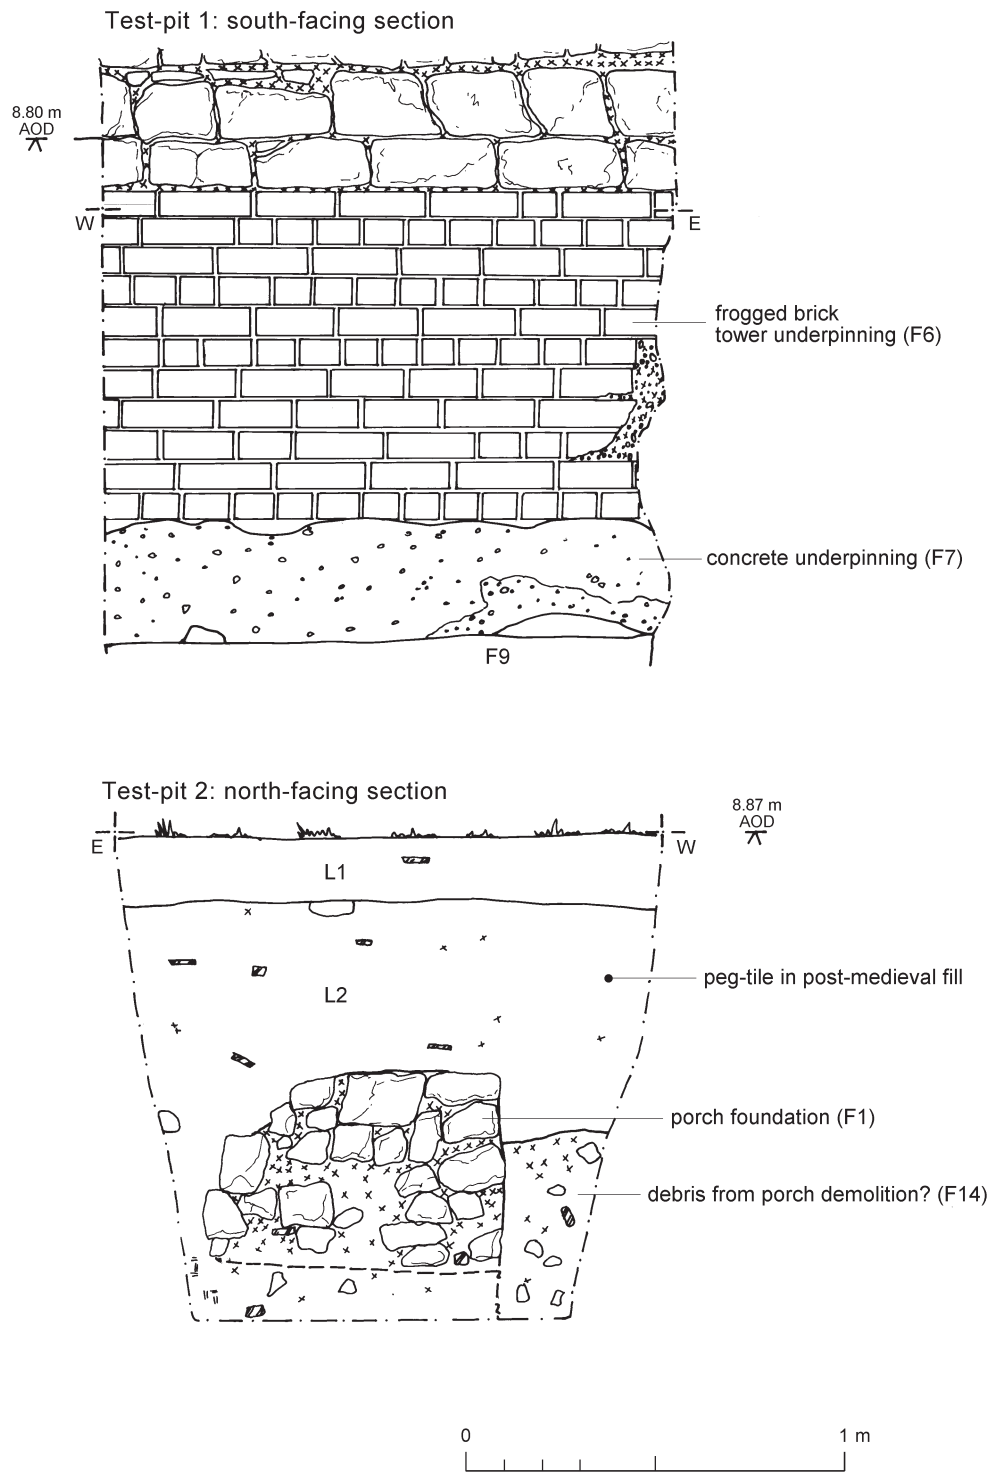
Test-pit 1: south-facing section (top), and Test-pit 2: north-facing section (bottom).
